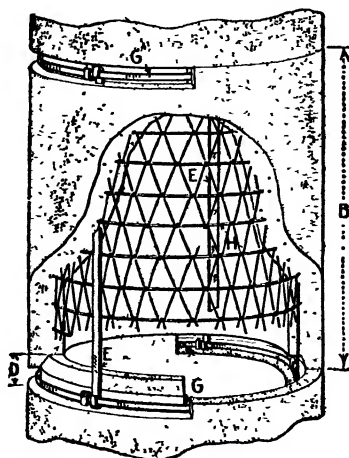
Standard reinforced concrete pipe. See Table 97, page 374.
